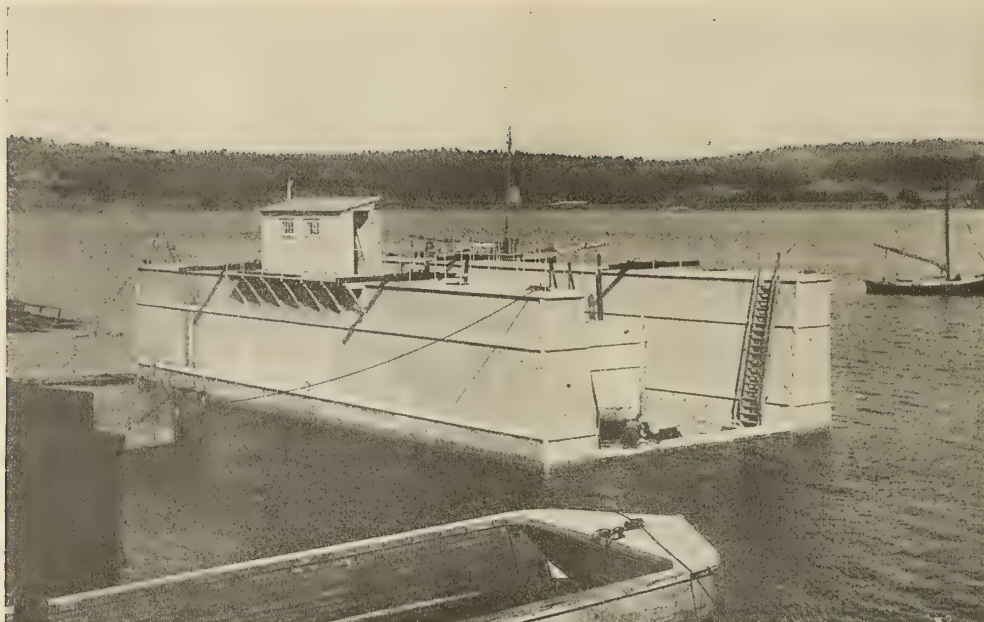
Concrete Floating Dry Dock with Concrete Lighter on Board
